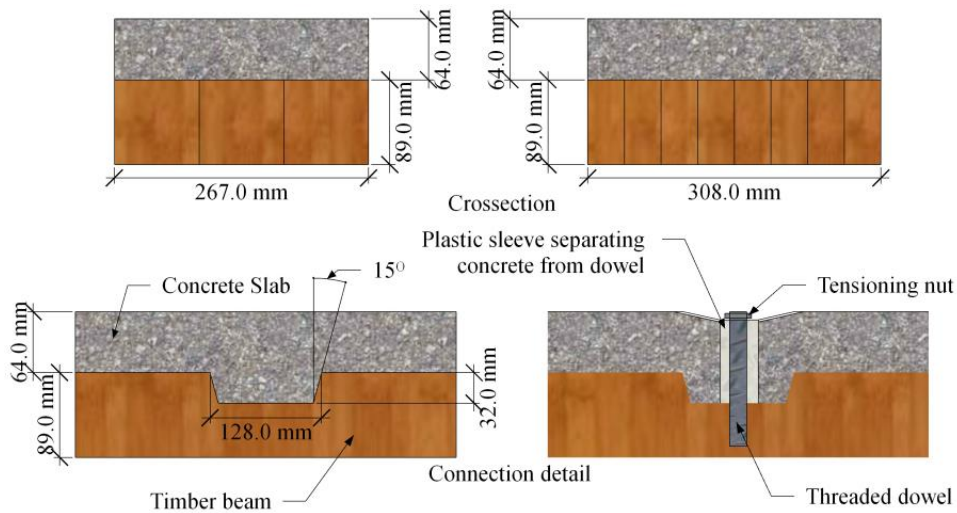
Cross-section and connection details. After Gutkowski et al [24].
